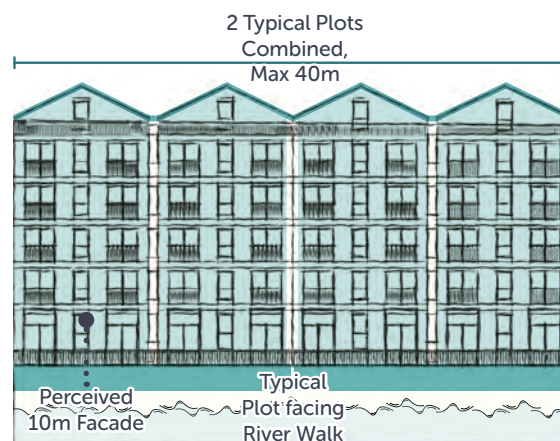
Waterfront Area Type - Elevation Diagram | Guidance Example
